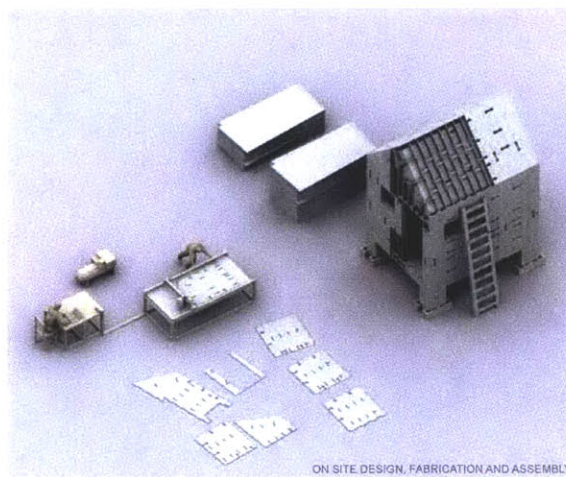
Your House, Prof. Larry Sass- Construction Steps [10][8]
